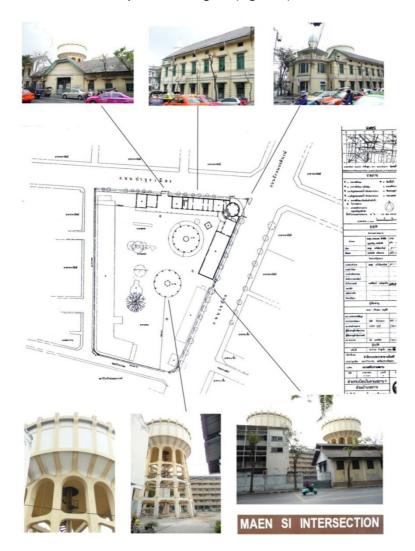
Plan of Maen Sri water tower and photographs (author) (source: Floor plan FAD, photographs author)
